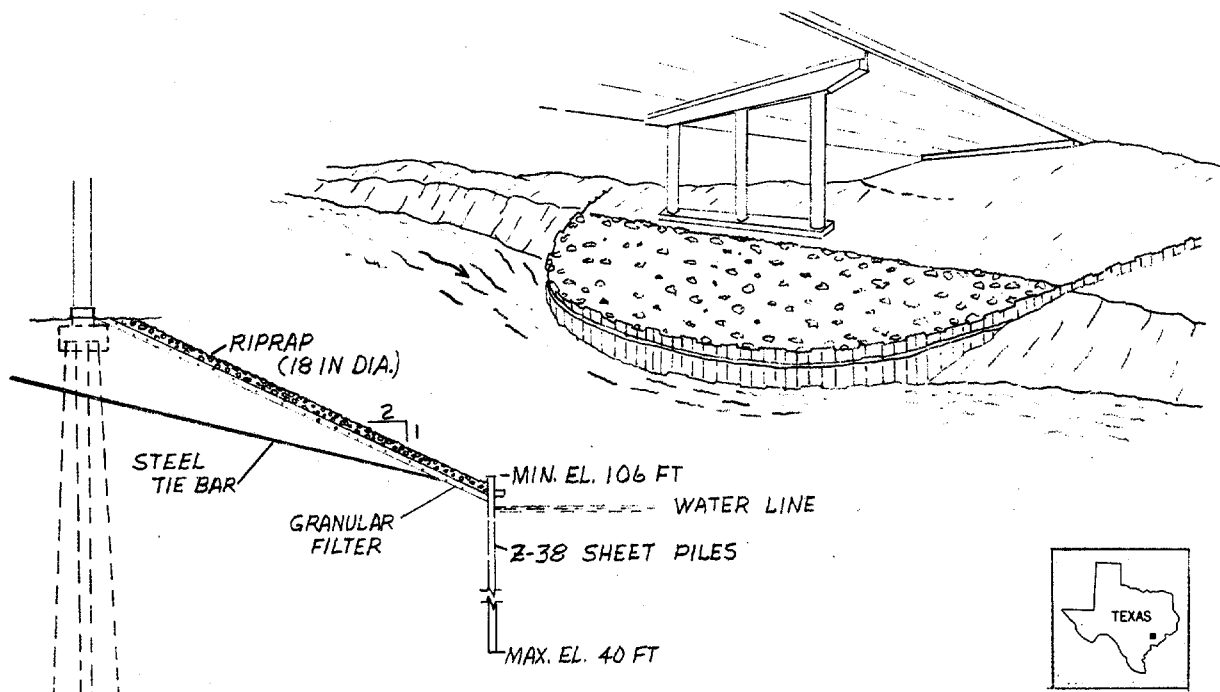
Cross section, left, and perspective sketch, right, of steel sheet-pile bulkhead at FM-529 crossing, Brazos River.
